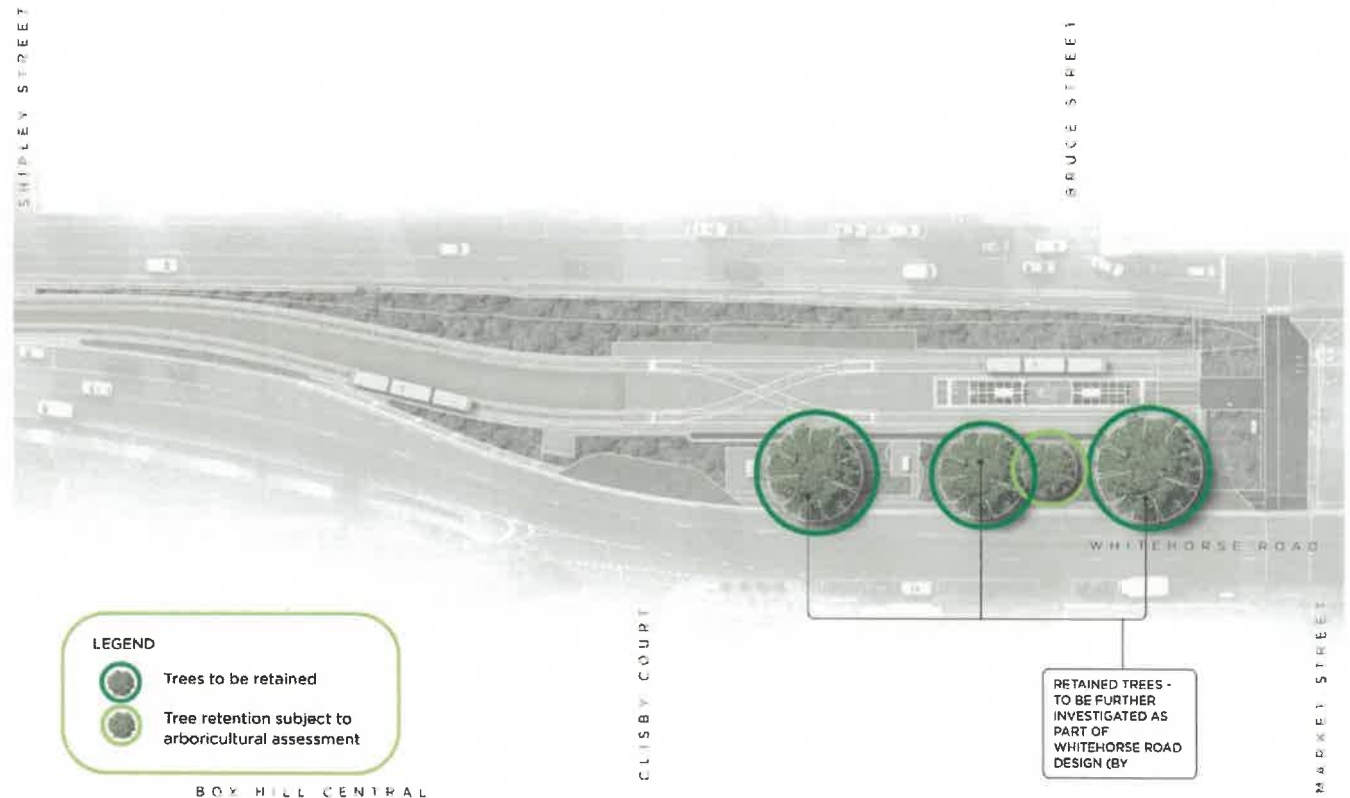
Trees to be retained (Refer Appendix A for scaled drawing)
